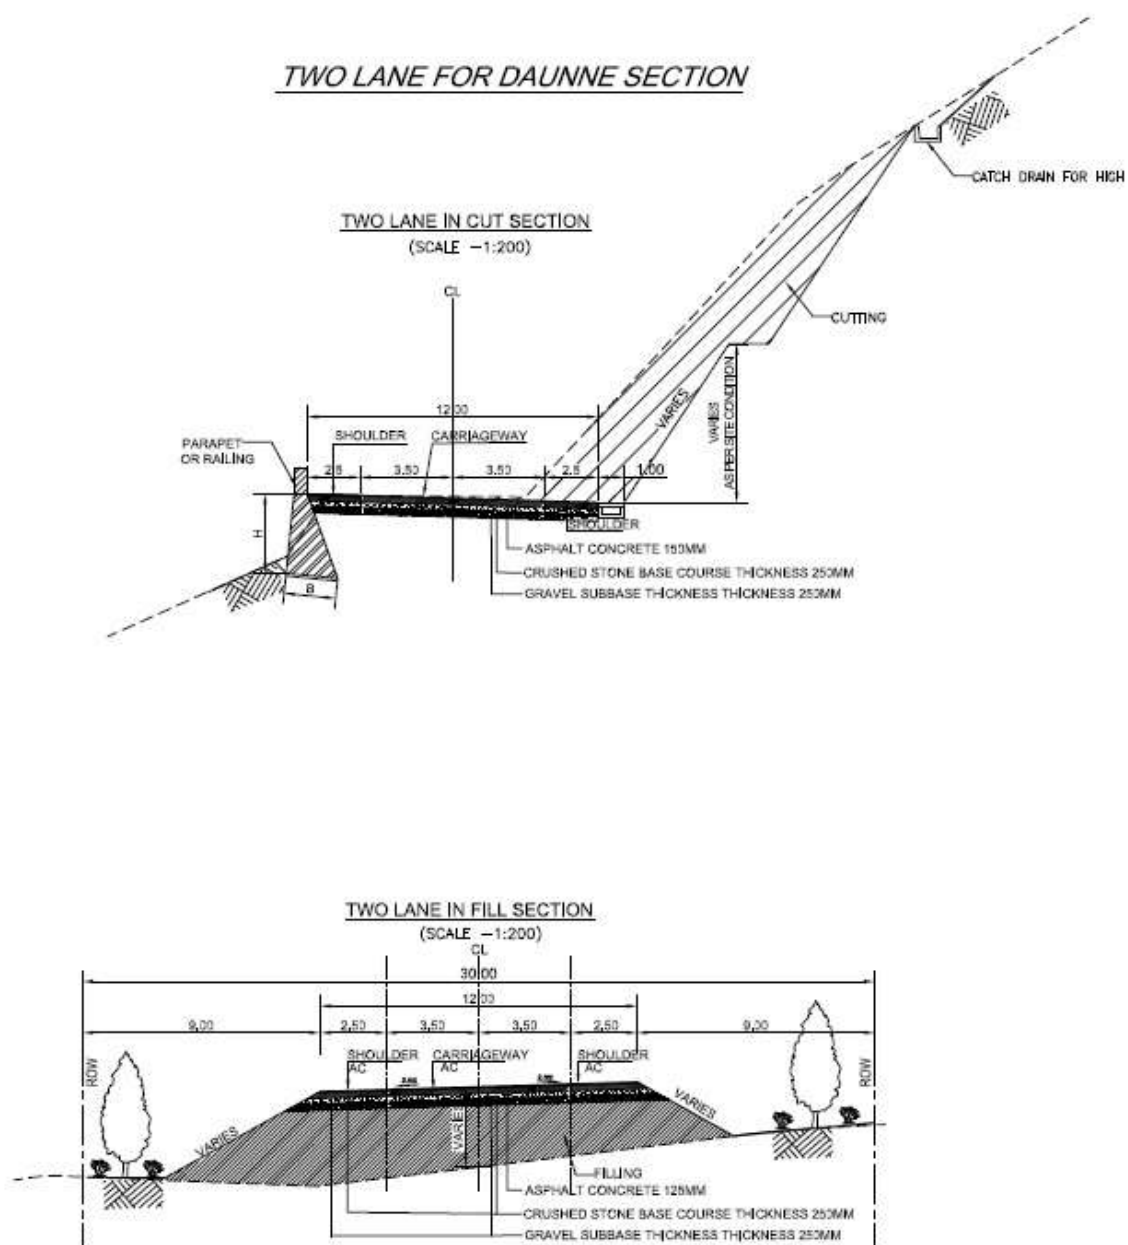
Typical Cross-section of 2-Lane Cut and Fill Sections
